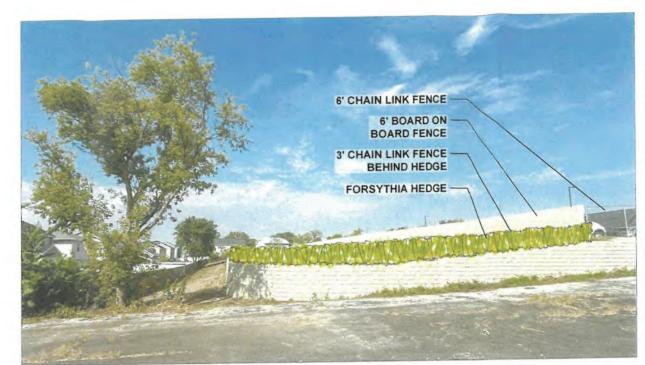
DETAIL A - VIEW LOOKING NORTH (NOT TO SCALE)
